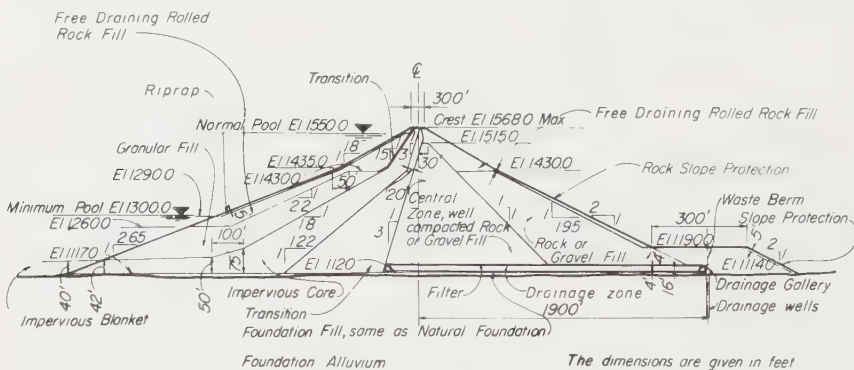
Cross section of Tarbela Dam, West Pakistan.
